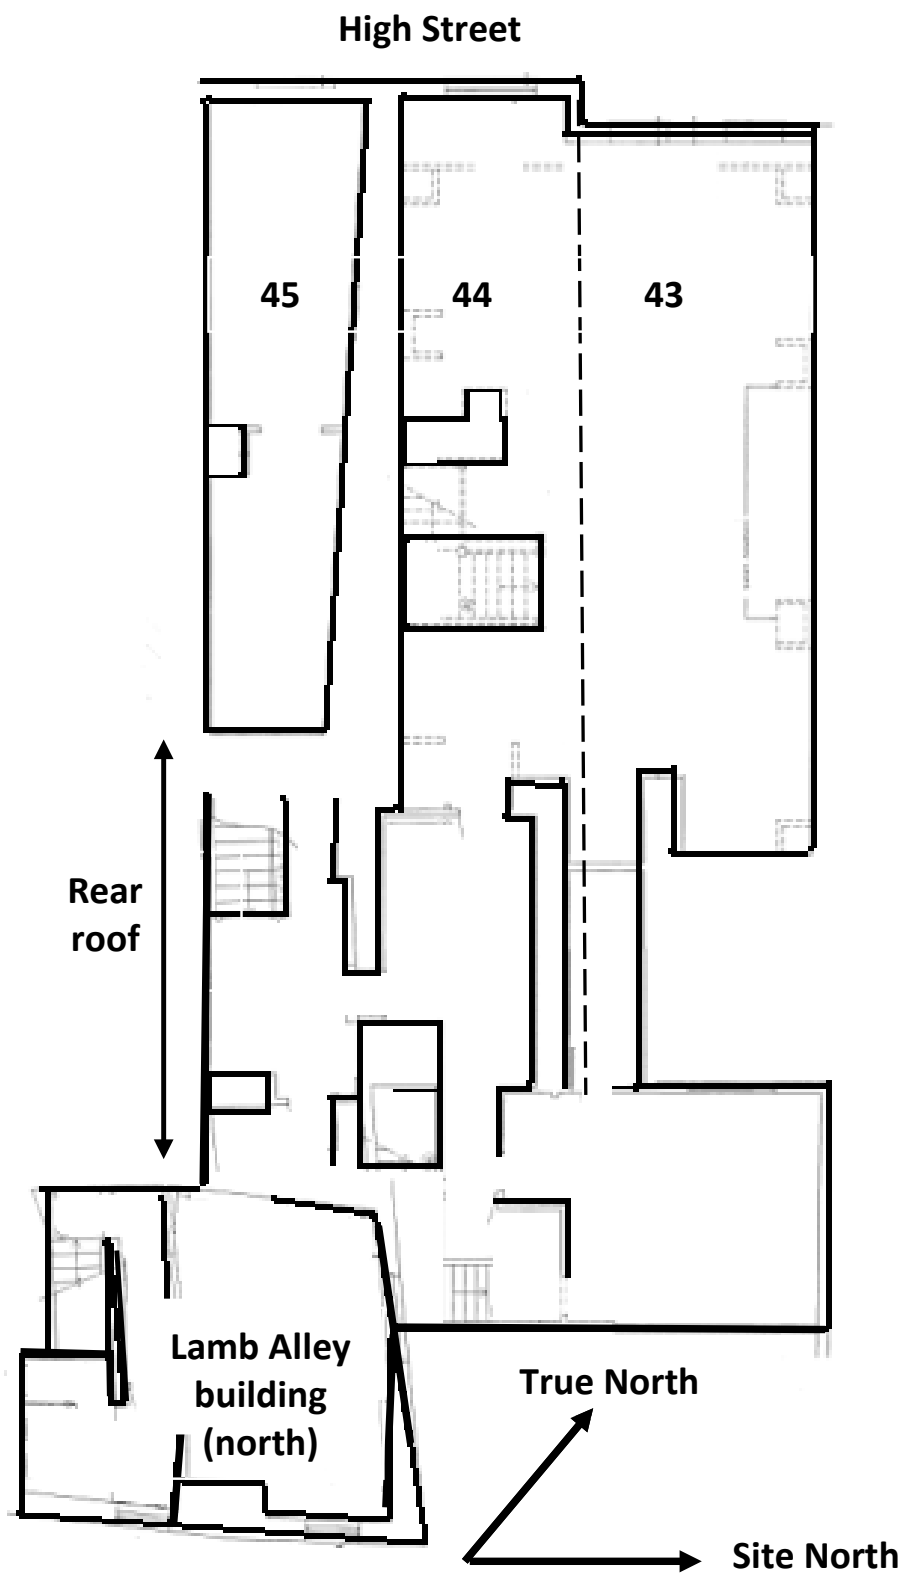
Outline plan of 43–45 High Street (after Ellis Belk Associates Ltd)
